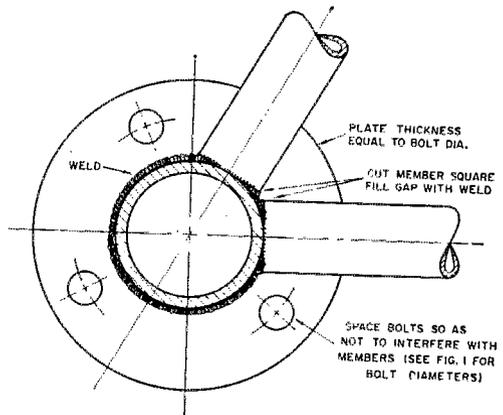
Detail sketch showing how section assembly flanges and crossbraces are welded to the vertical pipe legs. The flanges are of ordinary low-carbon steel. The outside diameter should be equal to the outside diameter of the largest vertical pipe at the joint, plus six times the diameter of the bolt used at the joint (see chart of Fig. 1). Ample wrench clearance will be provided if the center line of the bolt circle is laid out midway between the pipe and outer edge.
